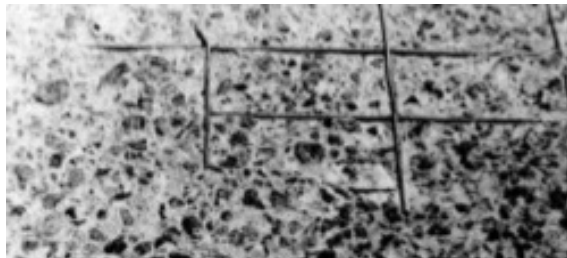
Abrasion of concrete surface could expose the reinforcements.
